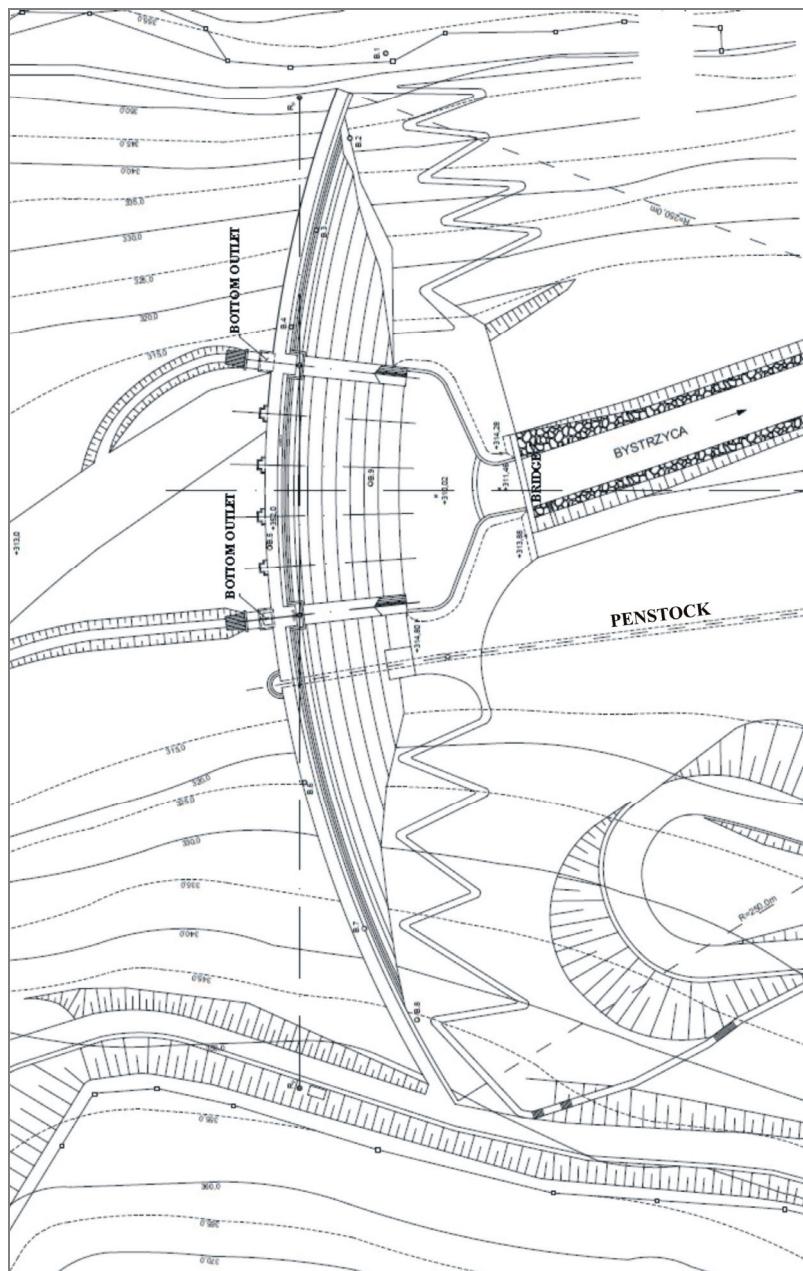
Functional plan of the Lubachów storage reservoir dam
